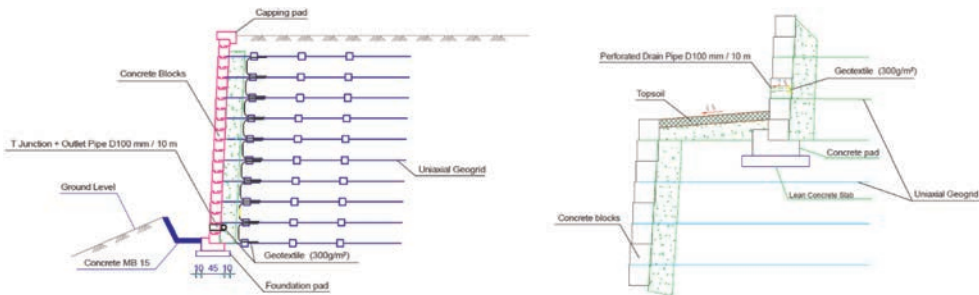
a) Detail of drainage behind concrete blocks facing; b) Detail of berms.
